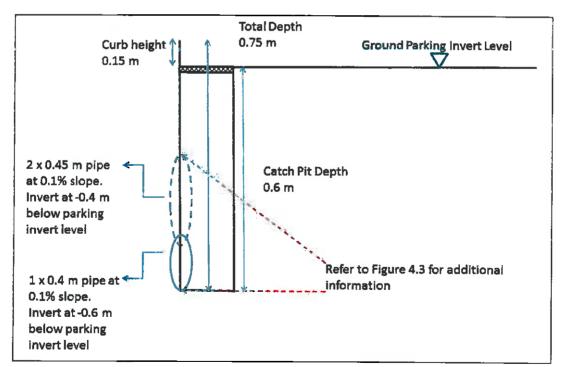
Conceptual Long Section Schematic of the Ground Level Catch Pit and the Stormwater Diversion Pipes.
